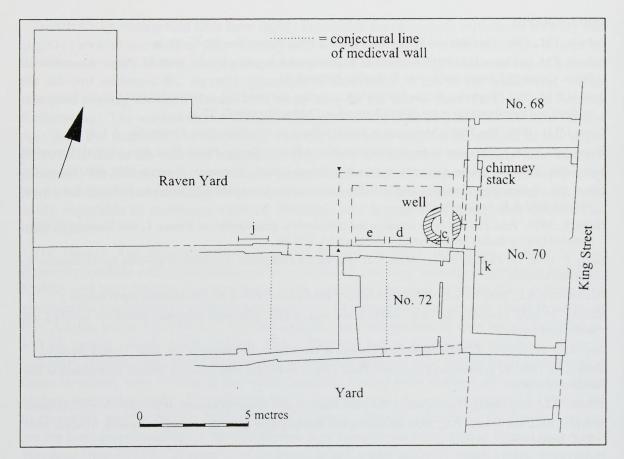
Nos 70 and 72 King Street, showing position of excavation trenches and location of architectural details
